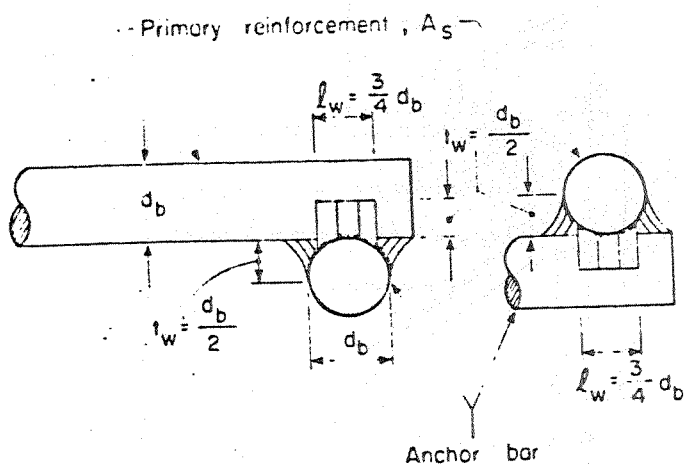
Weld details used in tests of Reference 11.43
